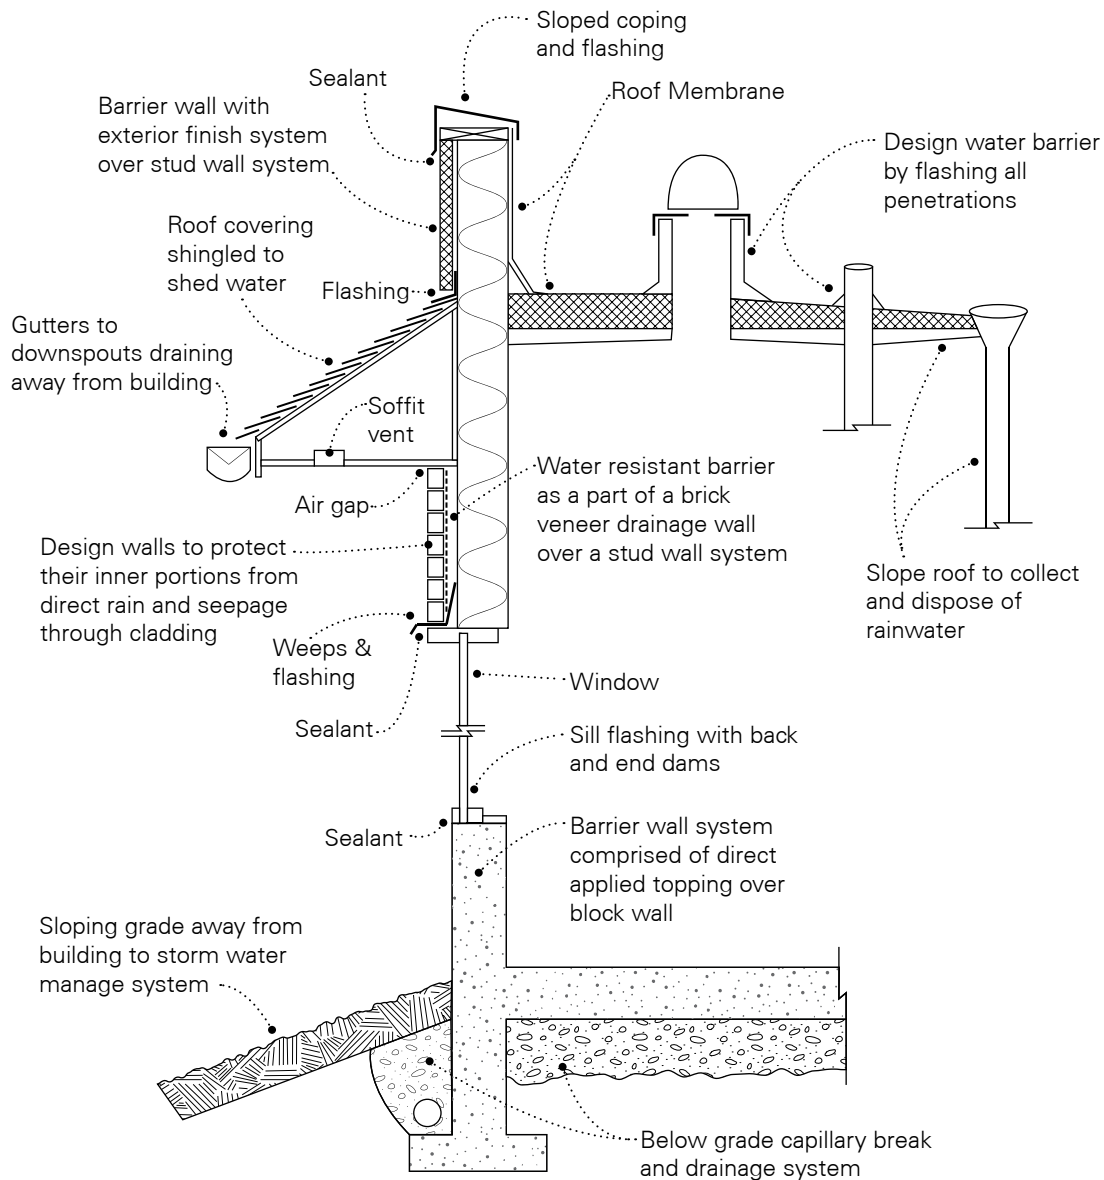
F Areas of Waterproofing for a Typical Foundation, Wall, and Roofing System
